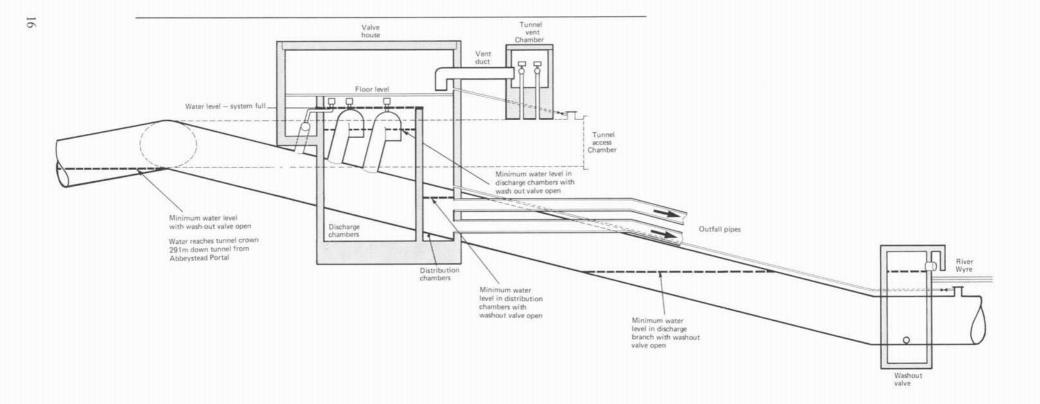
Abbeystead Schematic arrangement of outlet works showing water levels
